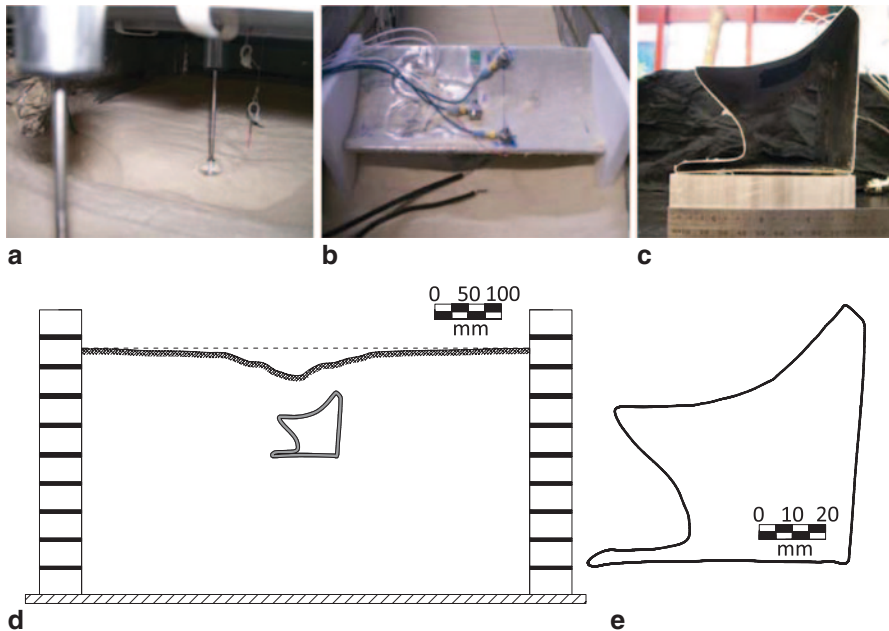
Collapse of the flexible tunnel during Test 2: a soil surface after the tunnel collapse, b excavation of the sand around the collapsed tunnel, c tunnel deformed profile, d deformed shape of the soil-tunnel model estimated by direct measurements taken after the main test and during the model excavation, e tunnel deformed profile estimated by direct measurements after the main test
